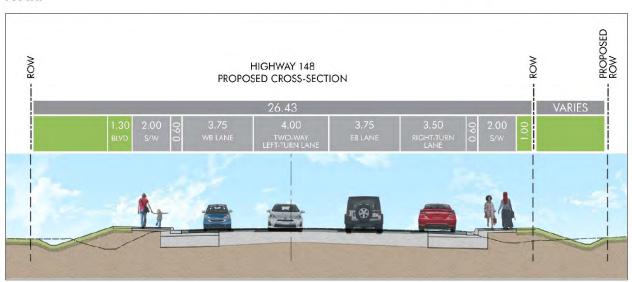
Typical Cross-Section – Highway 148, Angus Campbell Drive to Drive In Road
